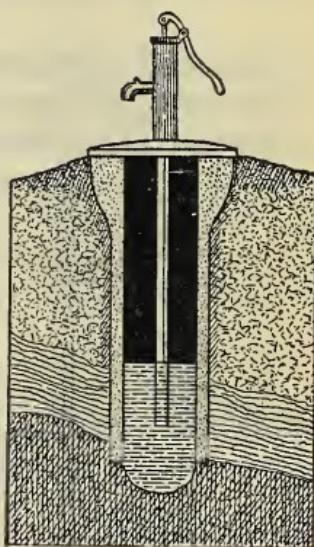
This drawing shows drainage sloping away from a properly constructed well
